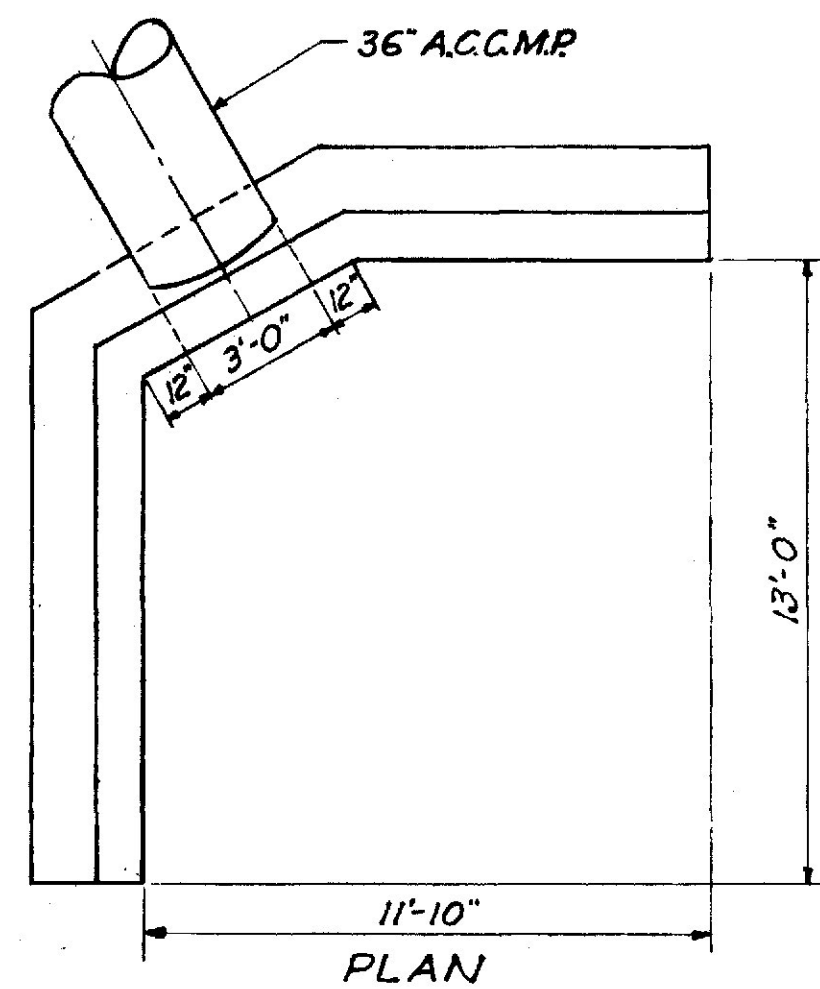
DETAIL OF END WALL NEAR FREEPORT WATER CO. DAM AT STA. 262+50±
